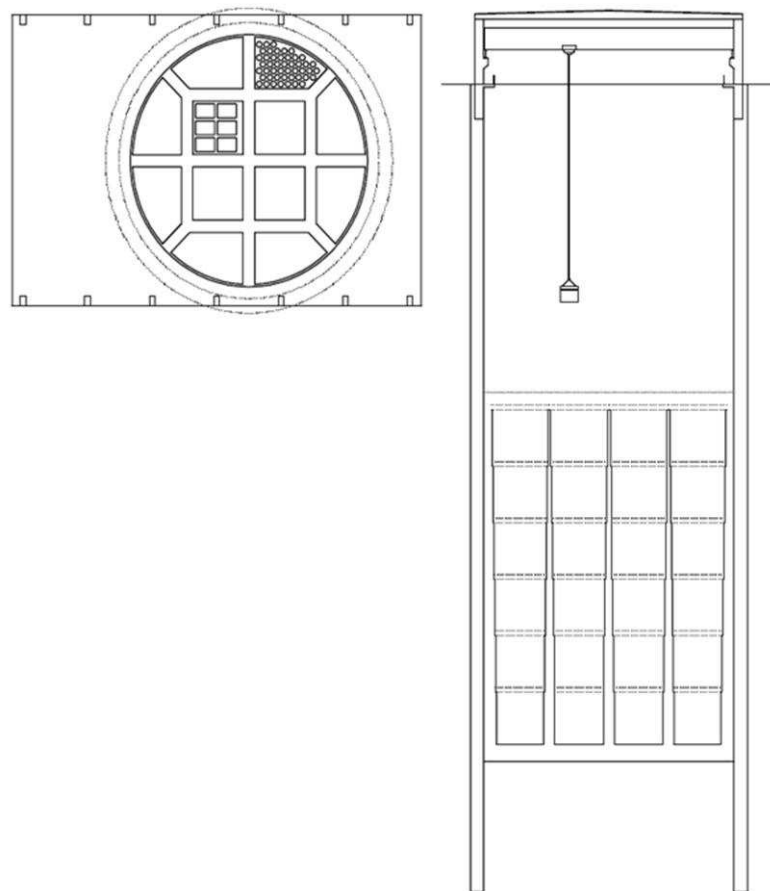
Ground plan and cross section of repository based on shaft operated from ground level, see also Drawing no. 1-10 in Appendix C.
